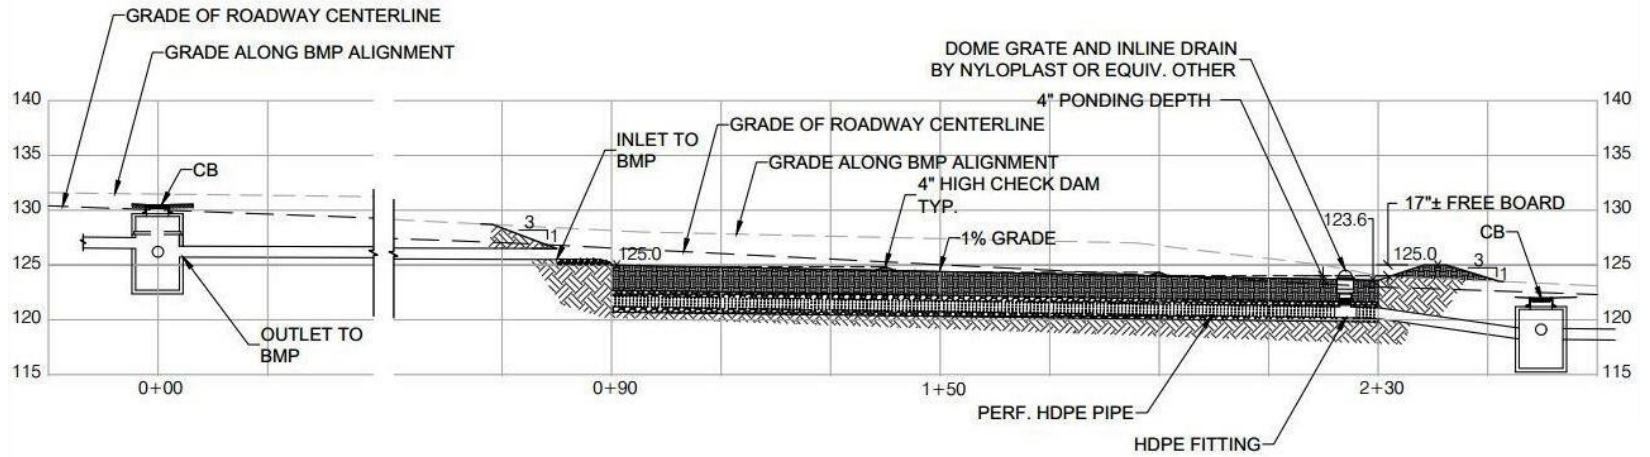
Horne St. bioretention system plans showing the profile view to connecting storm sewer pipes and grade of roadway (UNHSC, 2012b).
